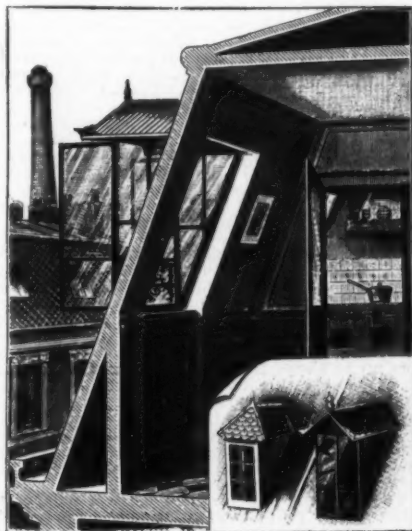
ARRANGEMENT OF A MANSARD ROOF.
